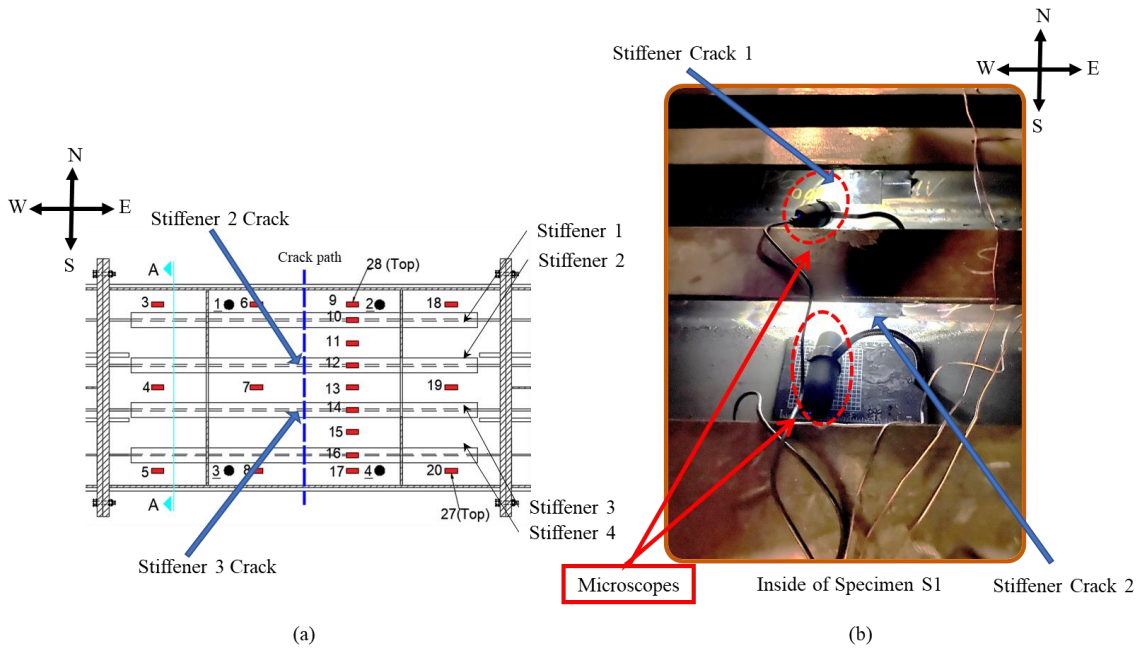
Locations of the cracks and microscopes inside the middle box of Specimen S1
